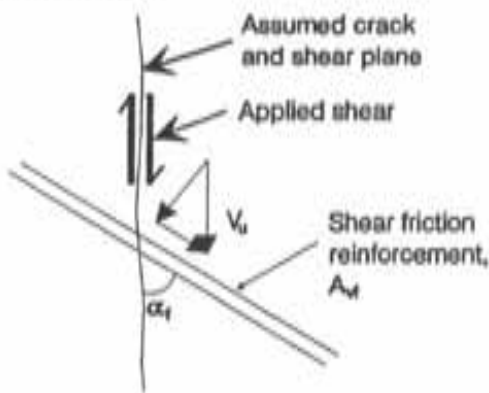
Shear-friction reinforcement at an angle to assumed crack
